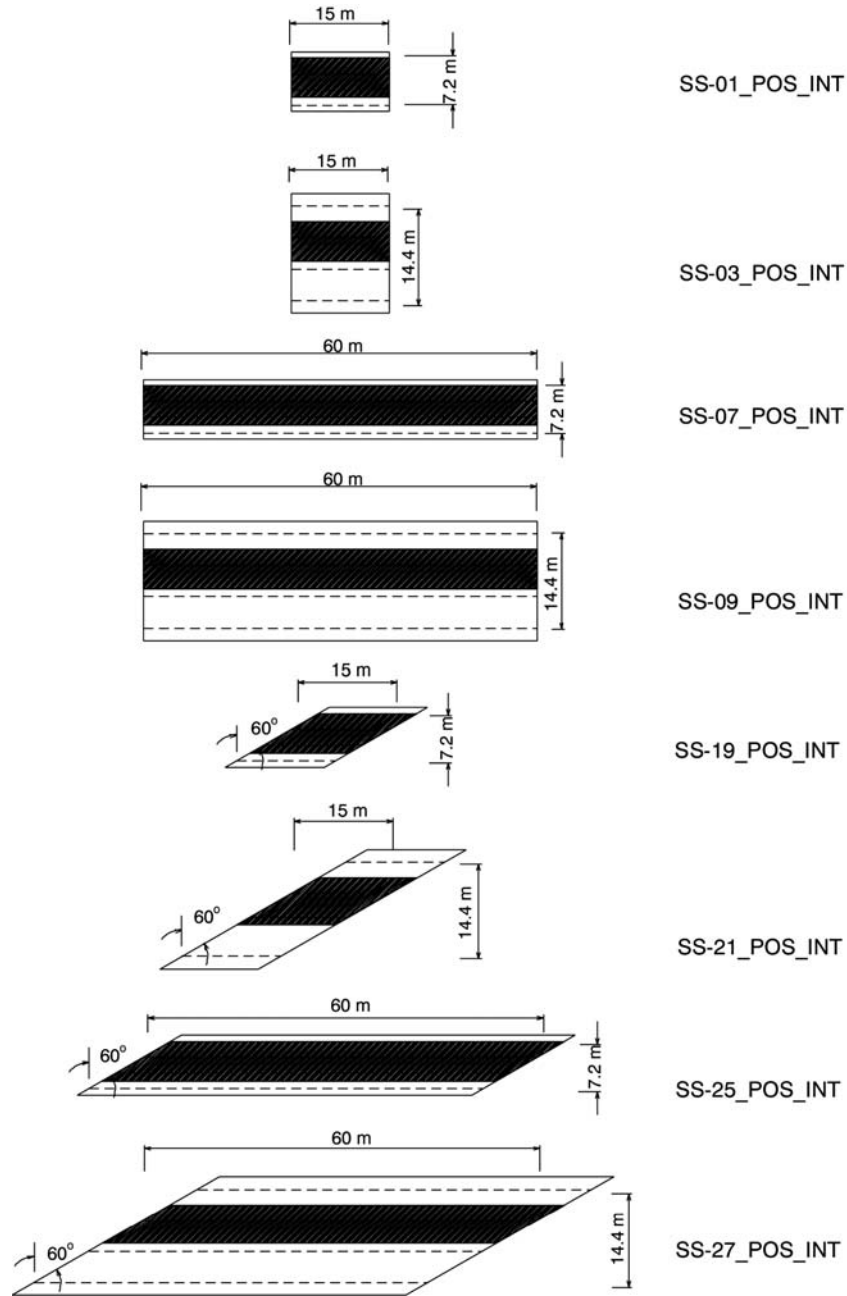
Lane load configurations, simple span, interior girder, positive moment.
